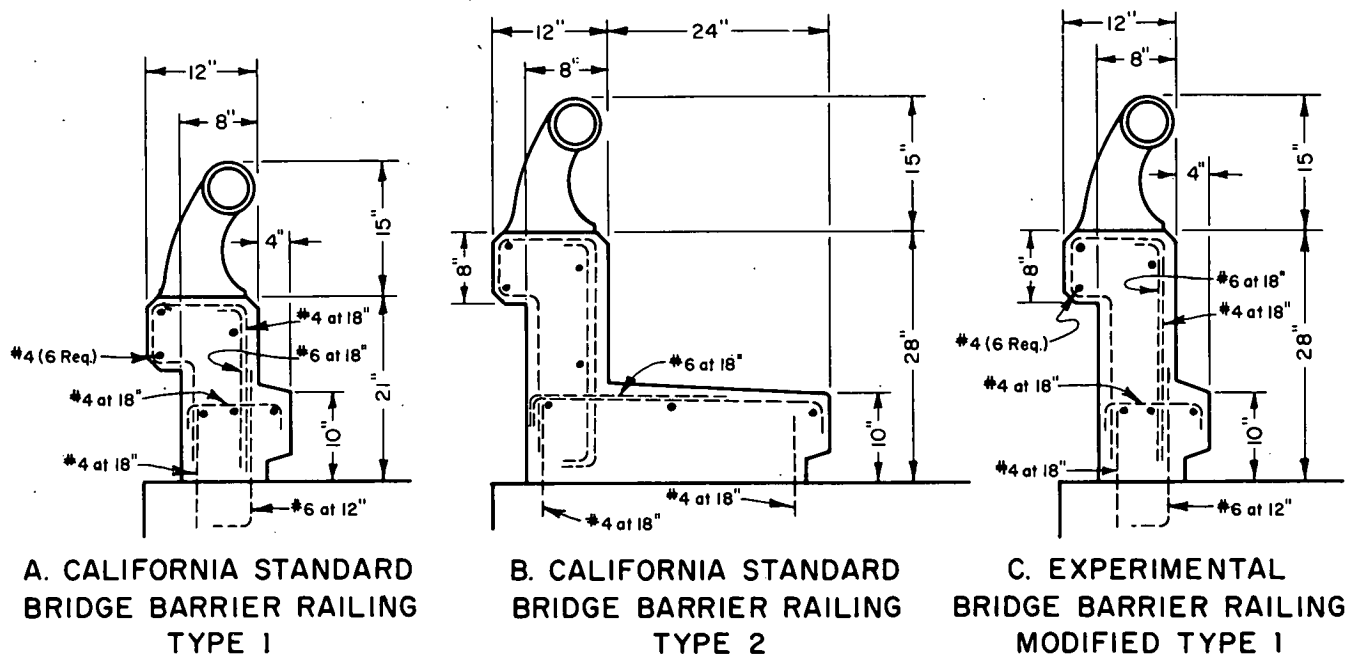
1963 bridge barrier rail tests. Source: Ref. 14, p. 145.
